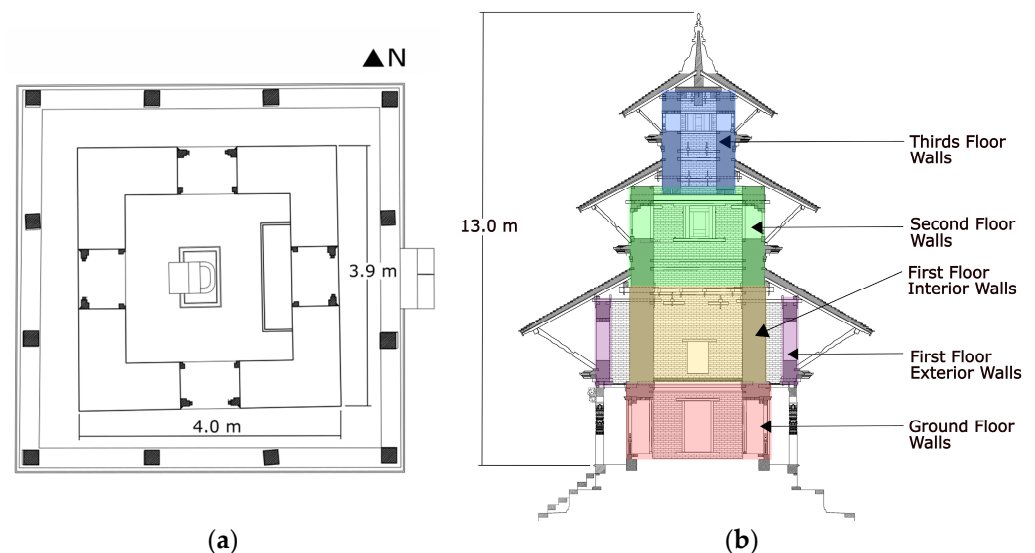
Gopinath temple. (a) Plan view layout of ground floor; (b) Cross-section view. Drawings created based on plans drawn by architect Purushottam Awal.
